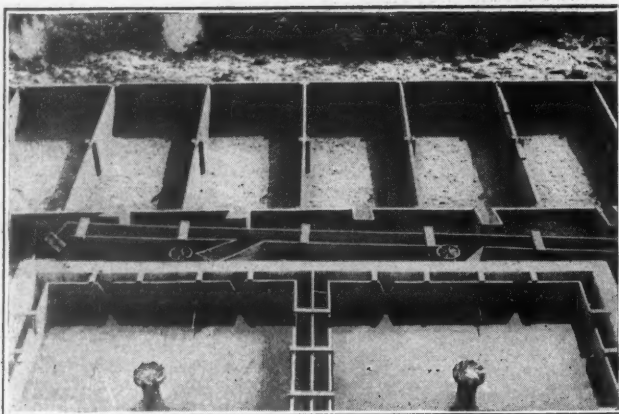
SPRINKLING FILTER DETAIL. Construction of slat sides and underdrains.
